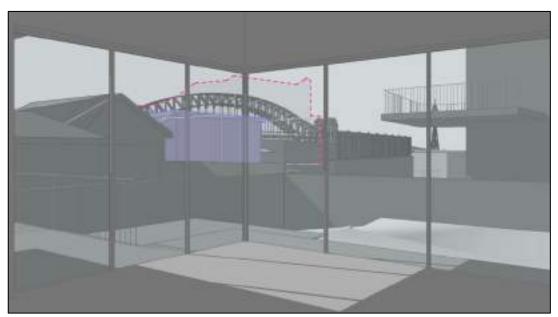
Existing view from kitchen/dining of No. 19 King George Street Source: Collins & Turner Architects
